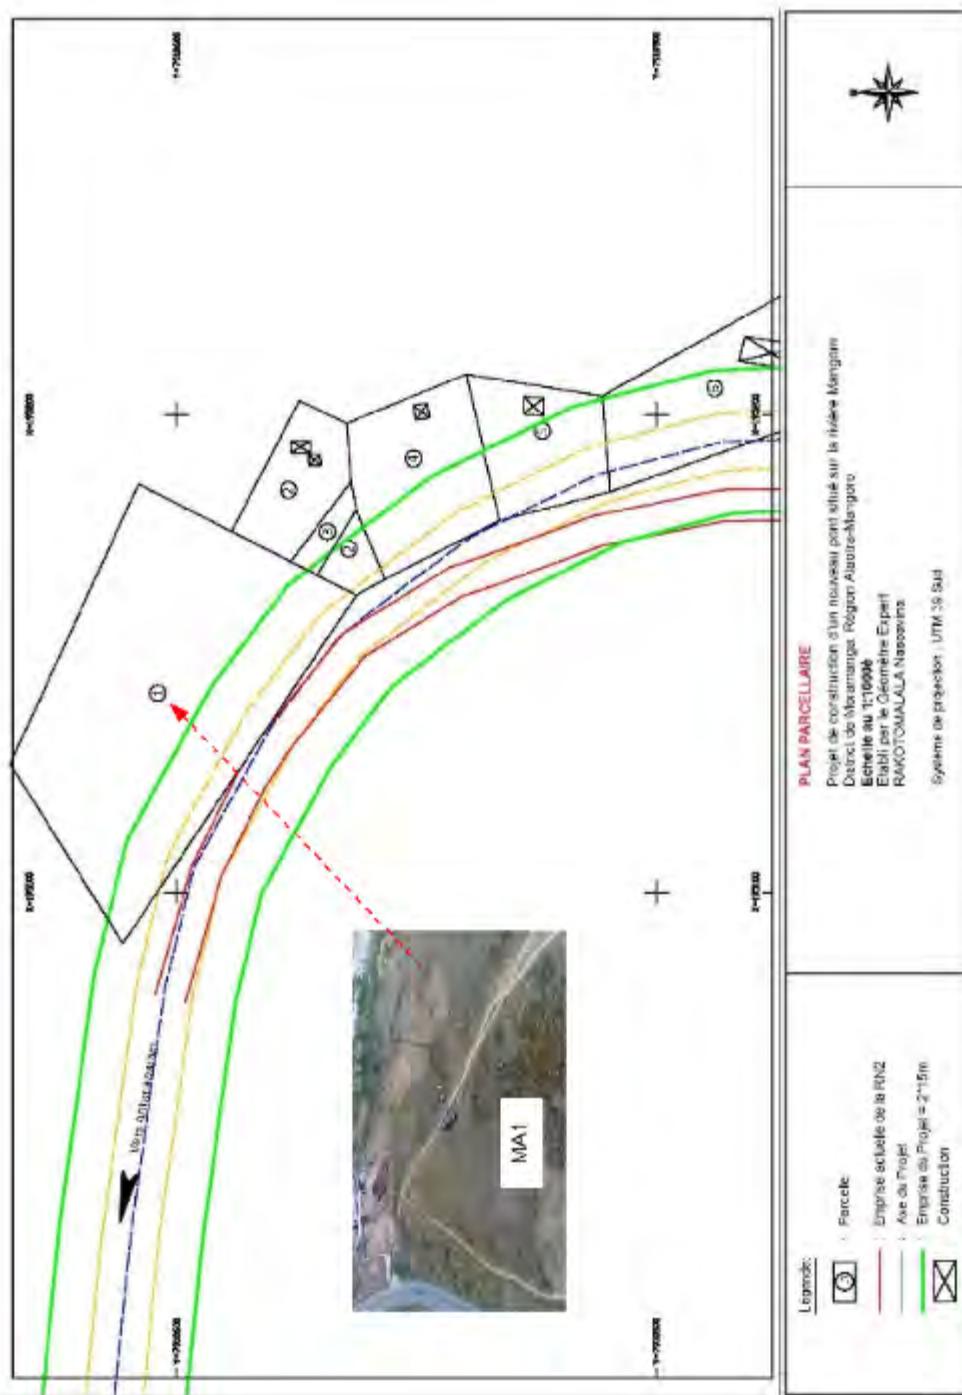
LAND PLOT PLAN – WANGORO 1
